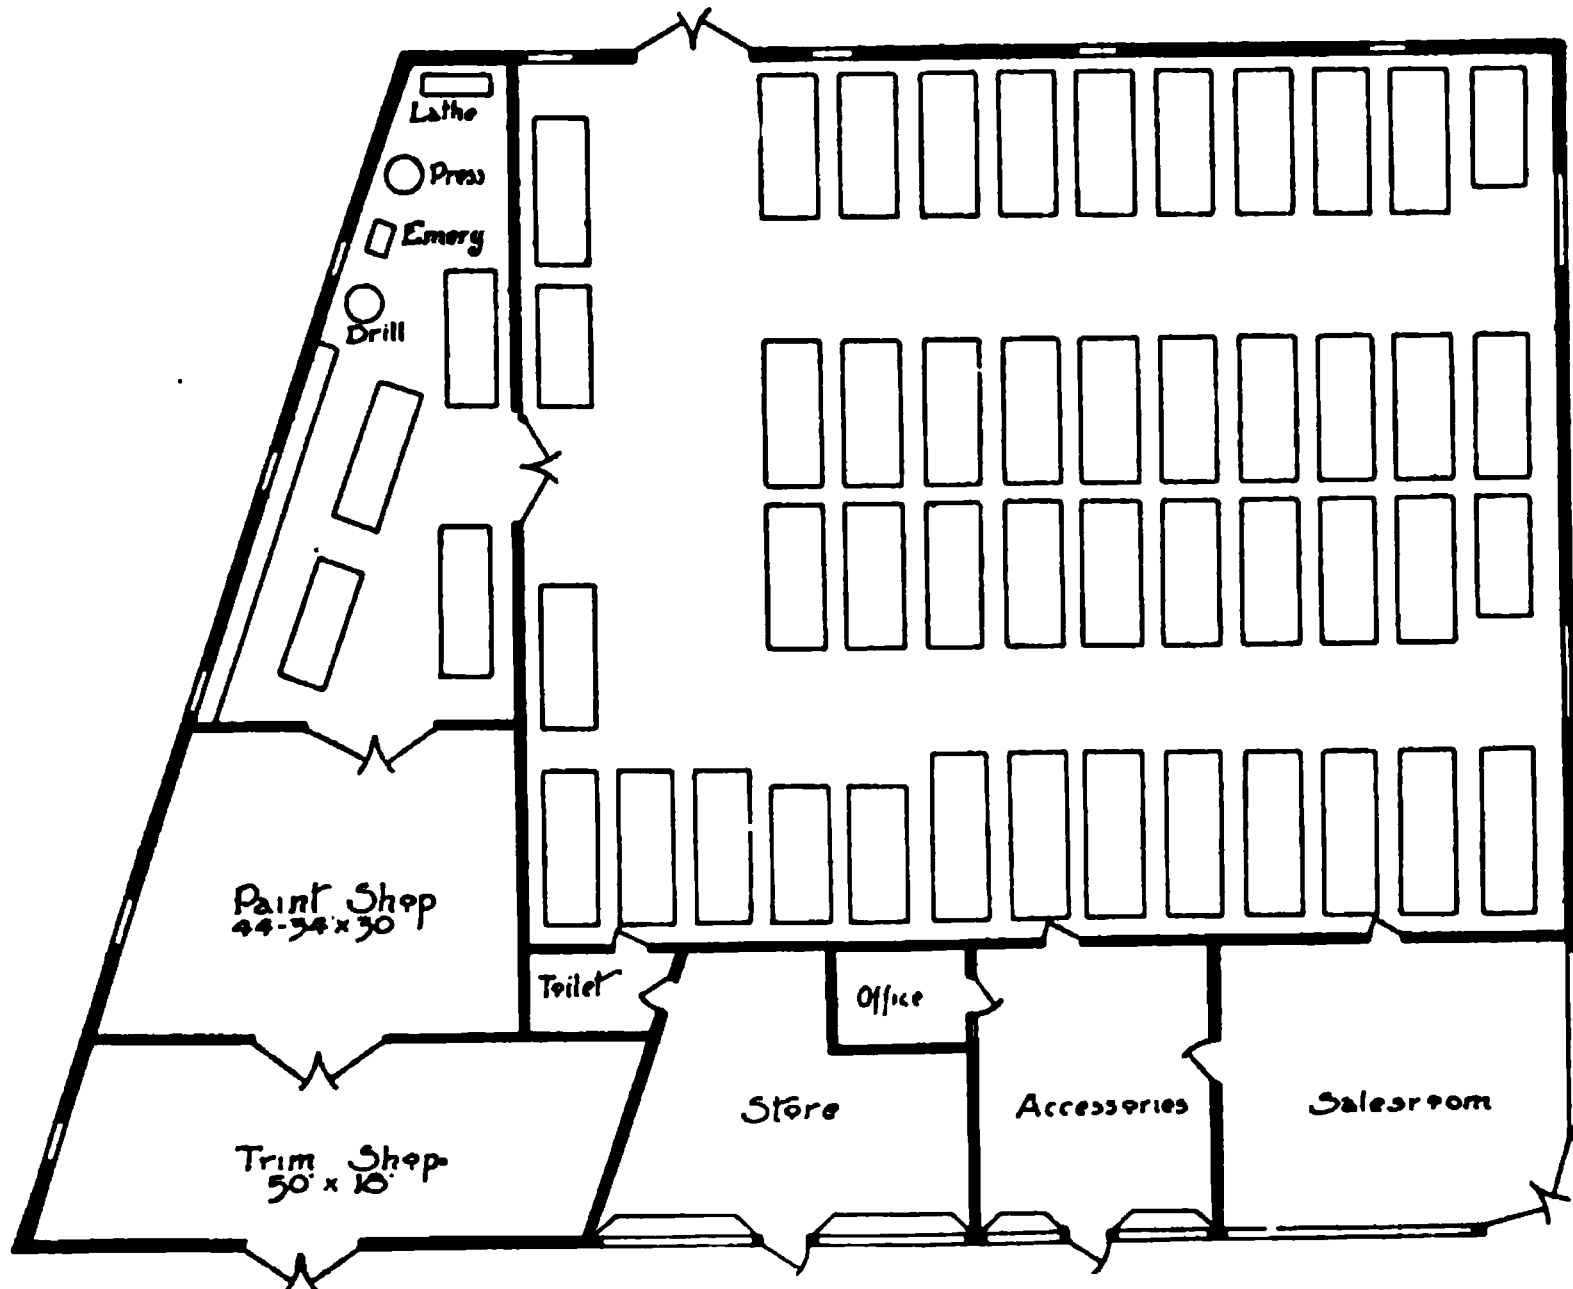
Rearrangement of Medium Garage Shown in Fig. 11, to Give More Regular Car Space
